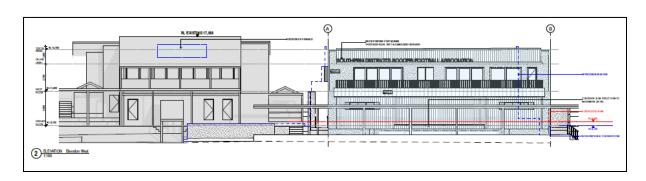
Proposed 5 west elevation under DA-1321/2021/A which show the outline of the approved built form (in blue dotted line).
